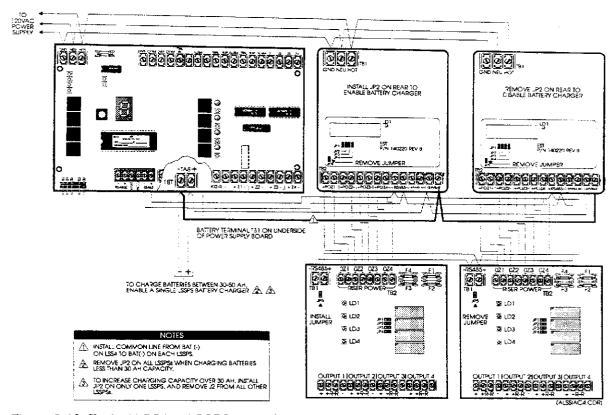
Typical LSS4 to LSSPS to 4IAC Wiring
